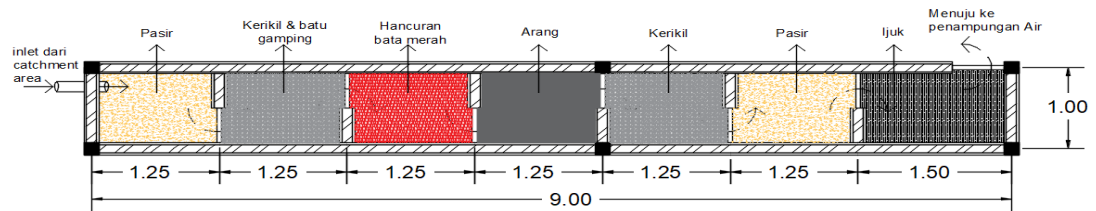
The RWHS filtration system for the female dormitory building on the campus E Sindangsari Untirta.
